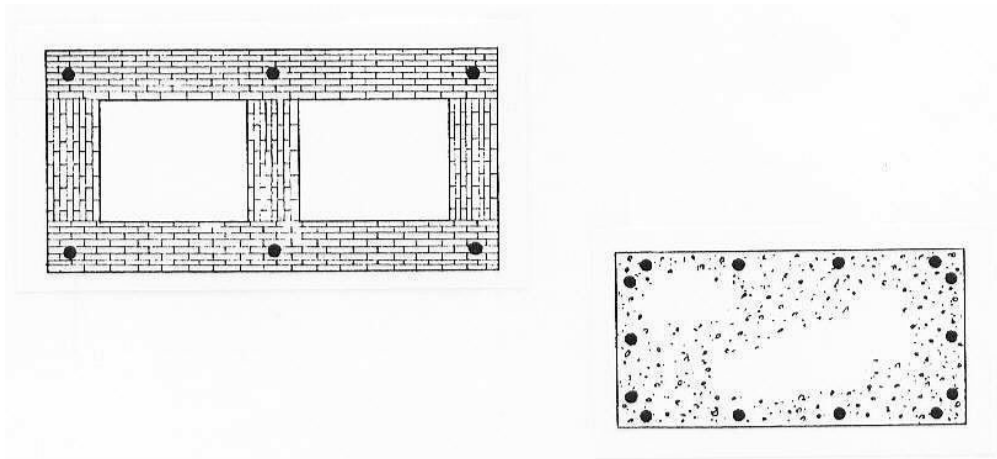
The plan views depict typical foundations for geared double-drum steam hoists. The foundation at left features wells for the hoist's cable drums. Source: Twitty, 2002:242.
